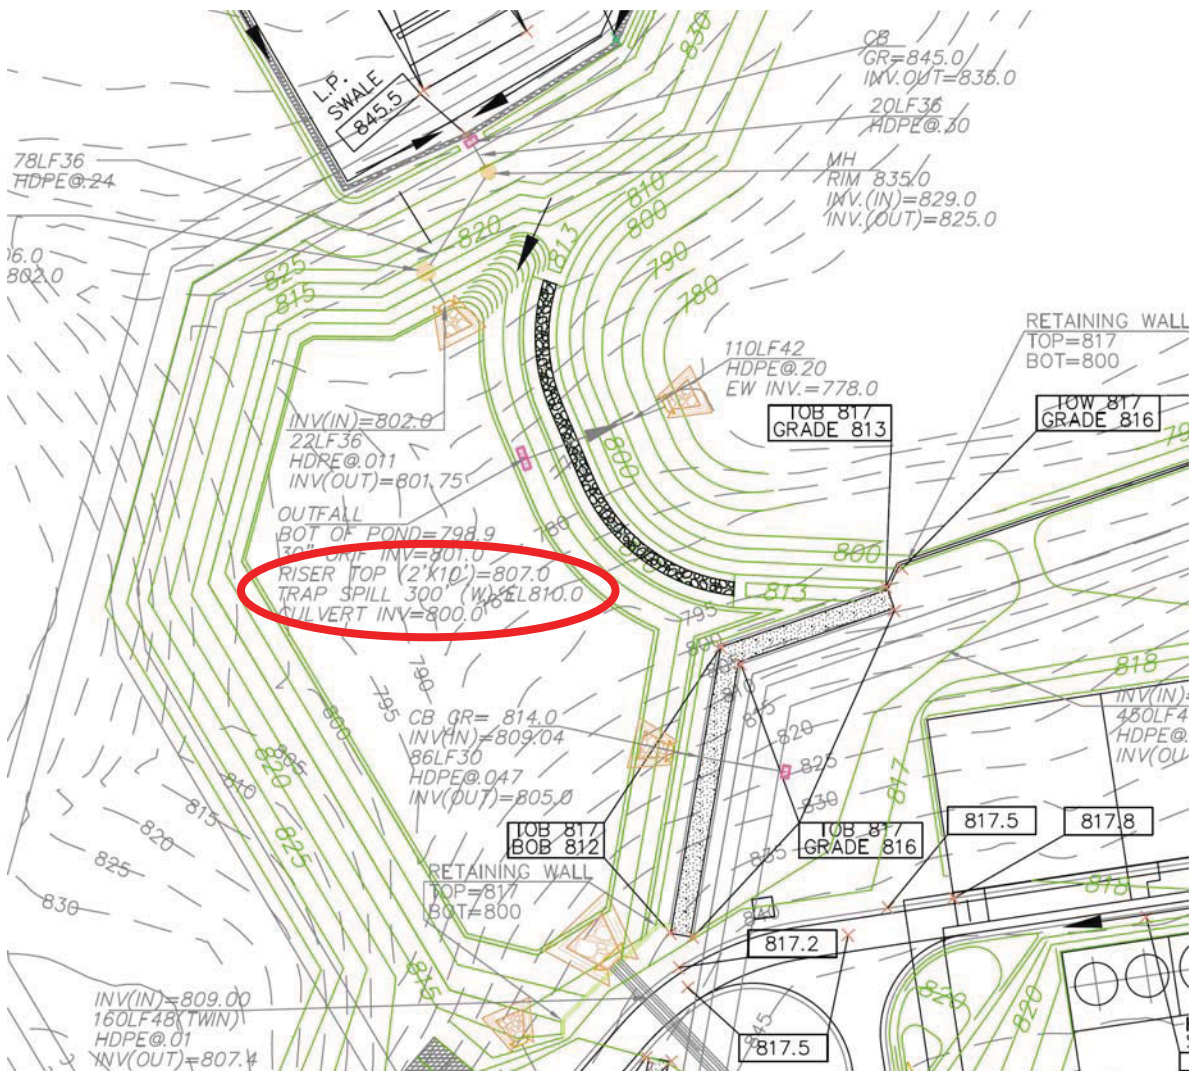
Drainage Pond A (Source: URS 2011b)
